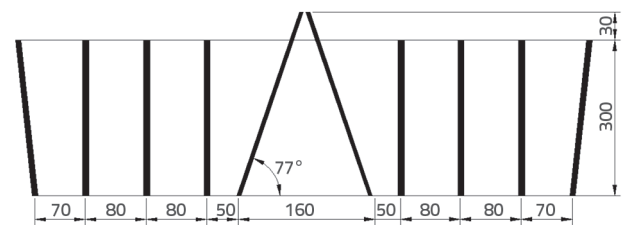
Schematic of section layout of blast holes (Unit: cm)
